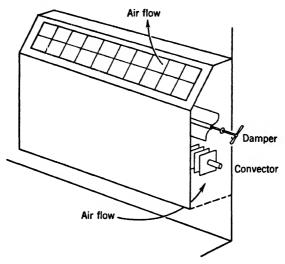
Convector and cover (with end removed) indicating air currents and adjustable damper.
